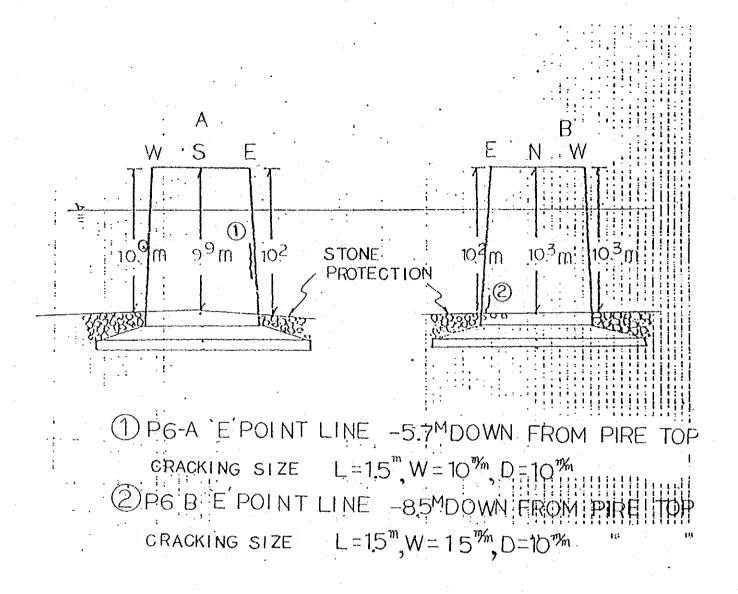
Visual Inspection Cracking at Pier 7-A,B
